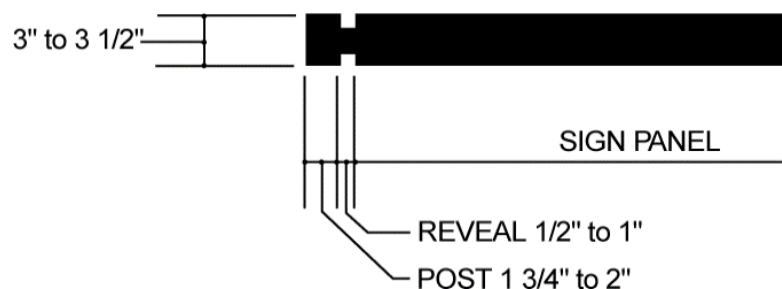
Figure G: Illustration of the dimensions for allowed driveway ground signs.
